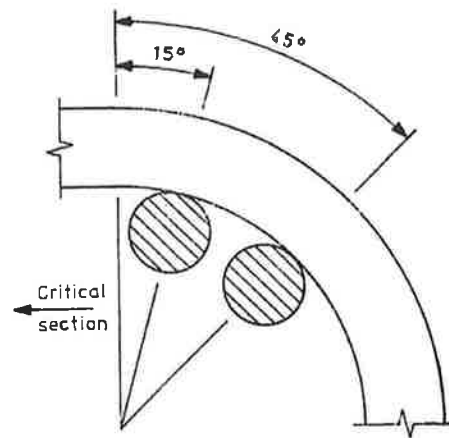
ARRANGEMENT OF ADDITIONAL TRANSVERSE BARS TO REDUCE BEARING STRESS
